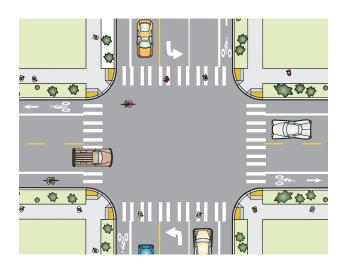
Separated sidewalks facilitate ramp and crosswalk alignment
